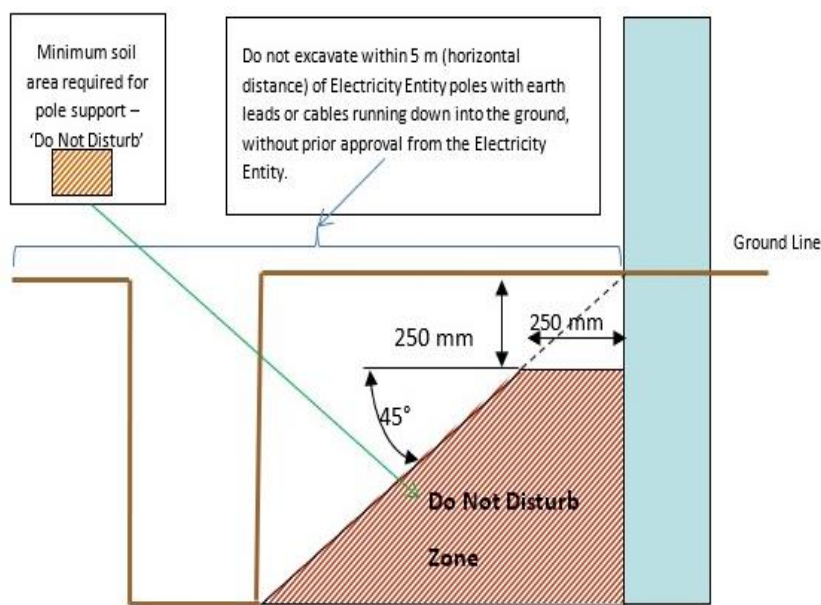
Do Not Disturb Zone requirements when excavating near poles
